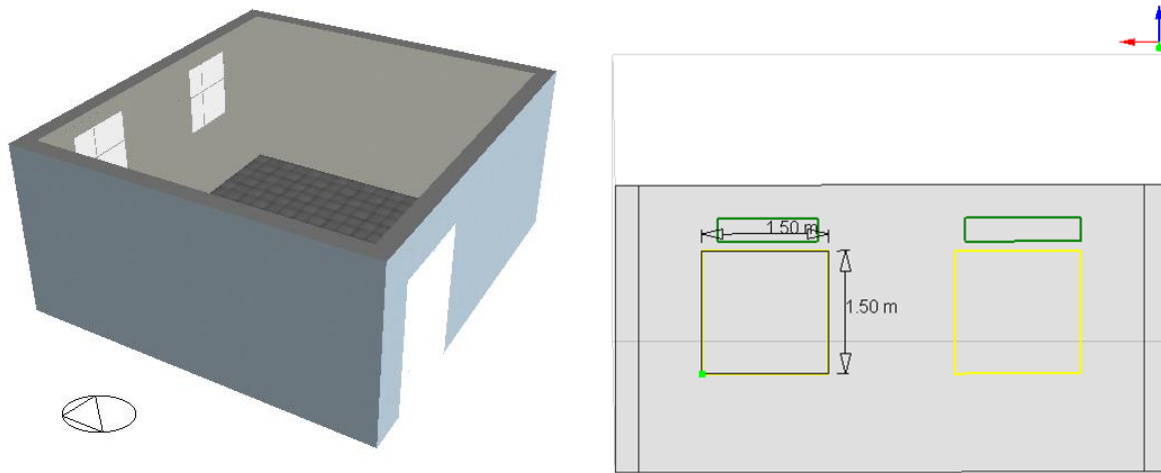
Left: 3D axonometric view for the classroom showing the windows and door openings. Right: plan view showing the dimensions of the windows
